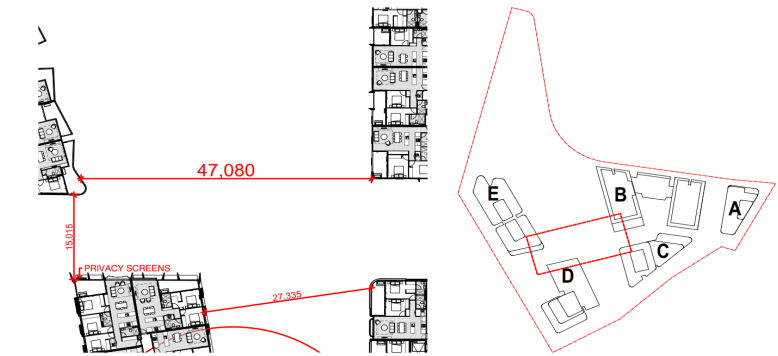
F1.7 Building B-E separation (storeys 1-9) & Key Plan
